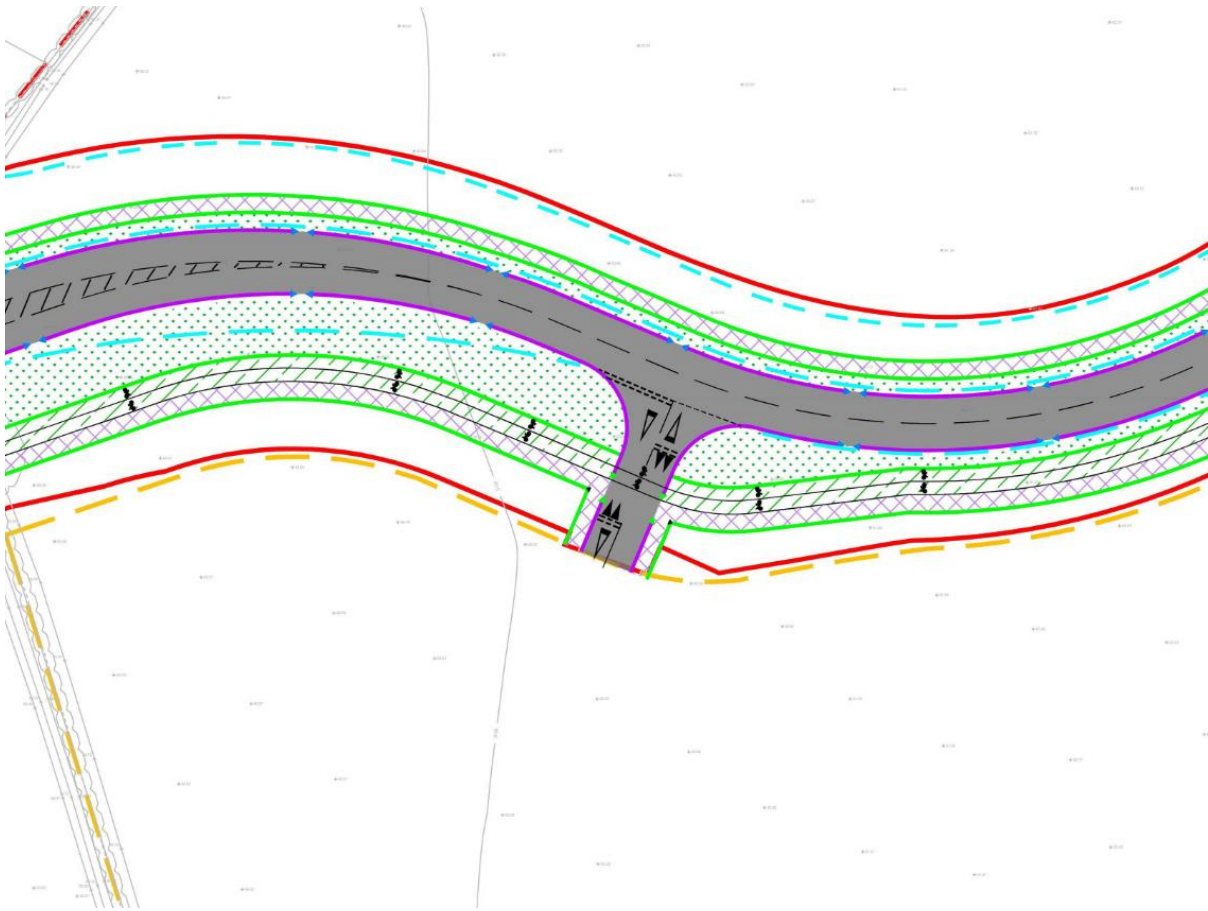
Side Road Priority (039578-Paving and Kerbing Sheet 2.pdf)
